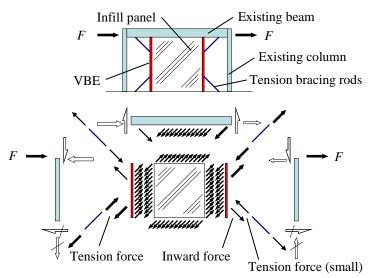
Concept and free-body diagram of Narrow Steel Plate Shear Wall with Tension Bracing (NSPW-TB).
